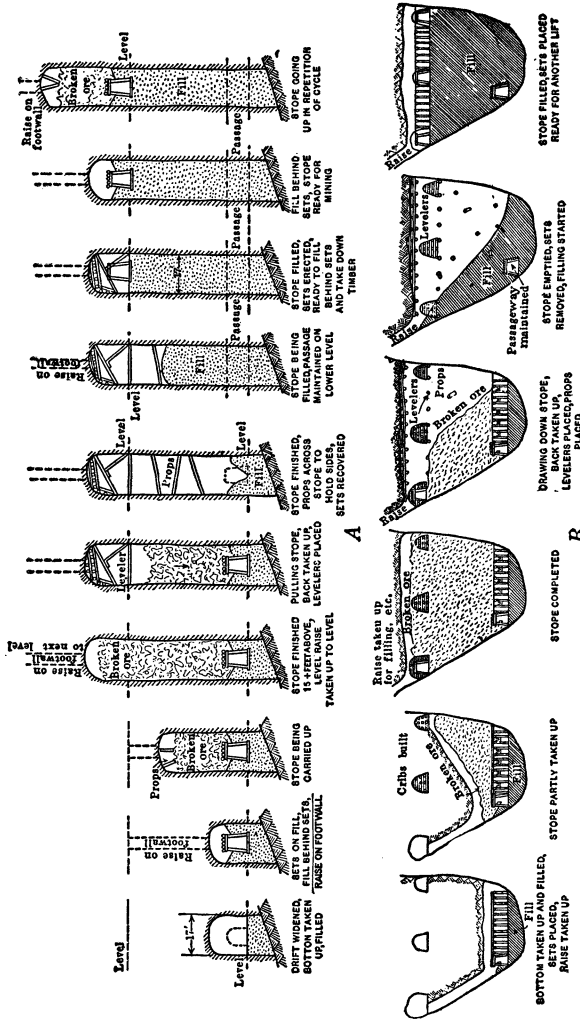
Successive stages in mining a transverse shrinkage stope. Franklin, N. J.: *A*, Transverse sections of transverse stope; *B*, longitudinal sections (after Haight and Tillson, *Trans. Am. Inst. Min. Eng.*).
